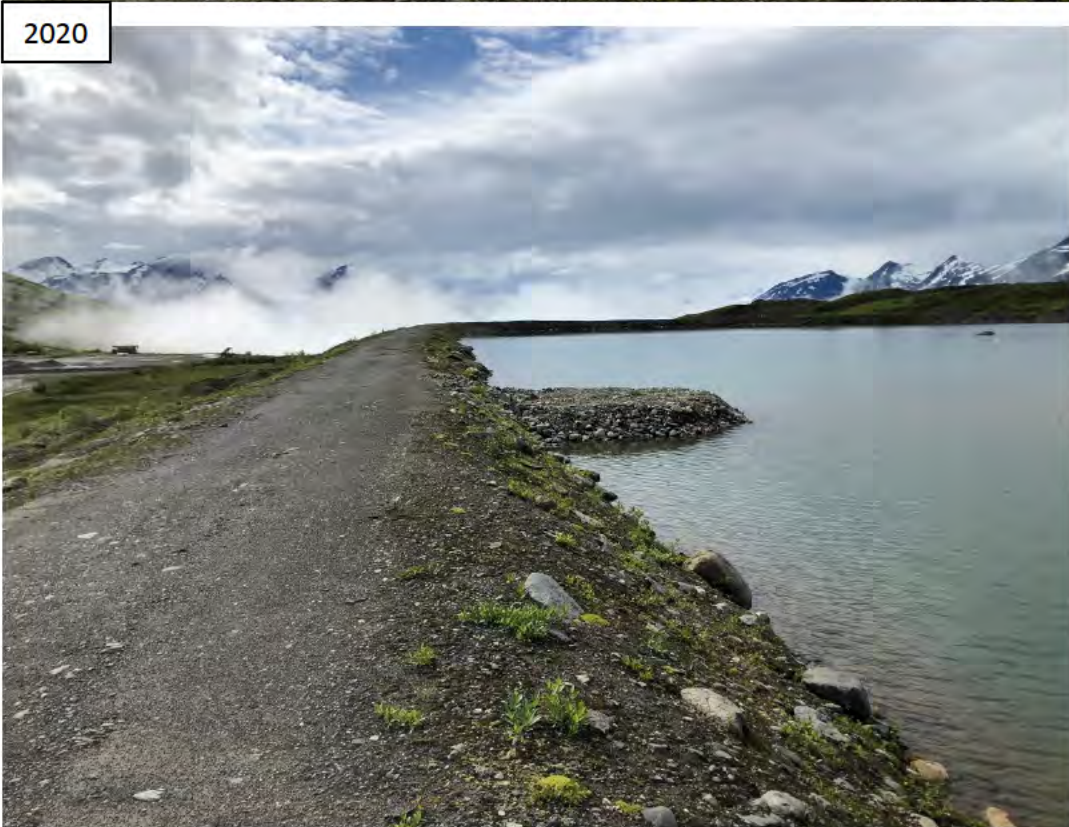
Southeast Dam Downstream Slope and Crest (SE-2)
